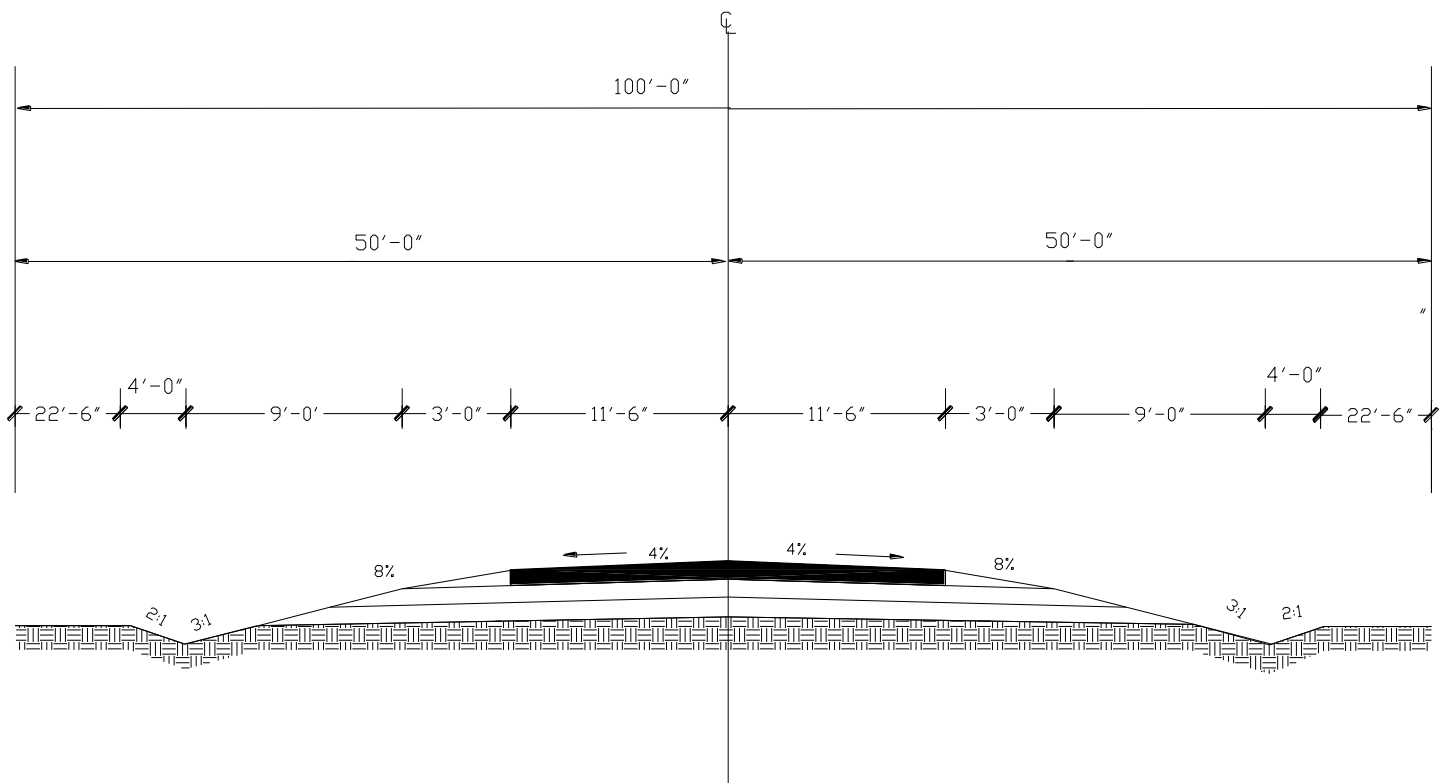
TYPICAL CROSS SECTION OF 100 FEET RIGHT OF WAY
